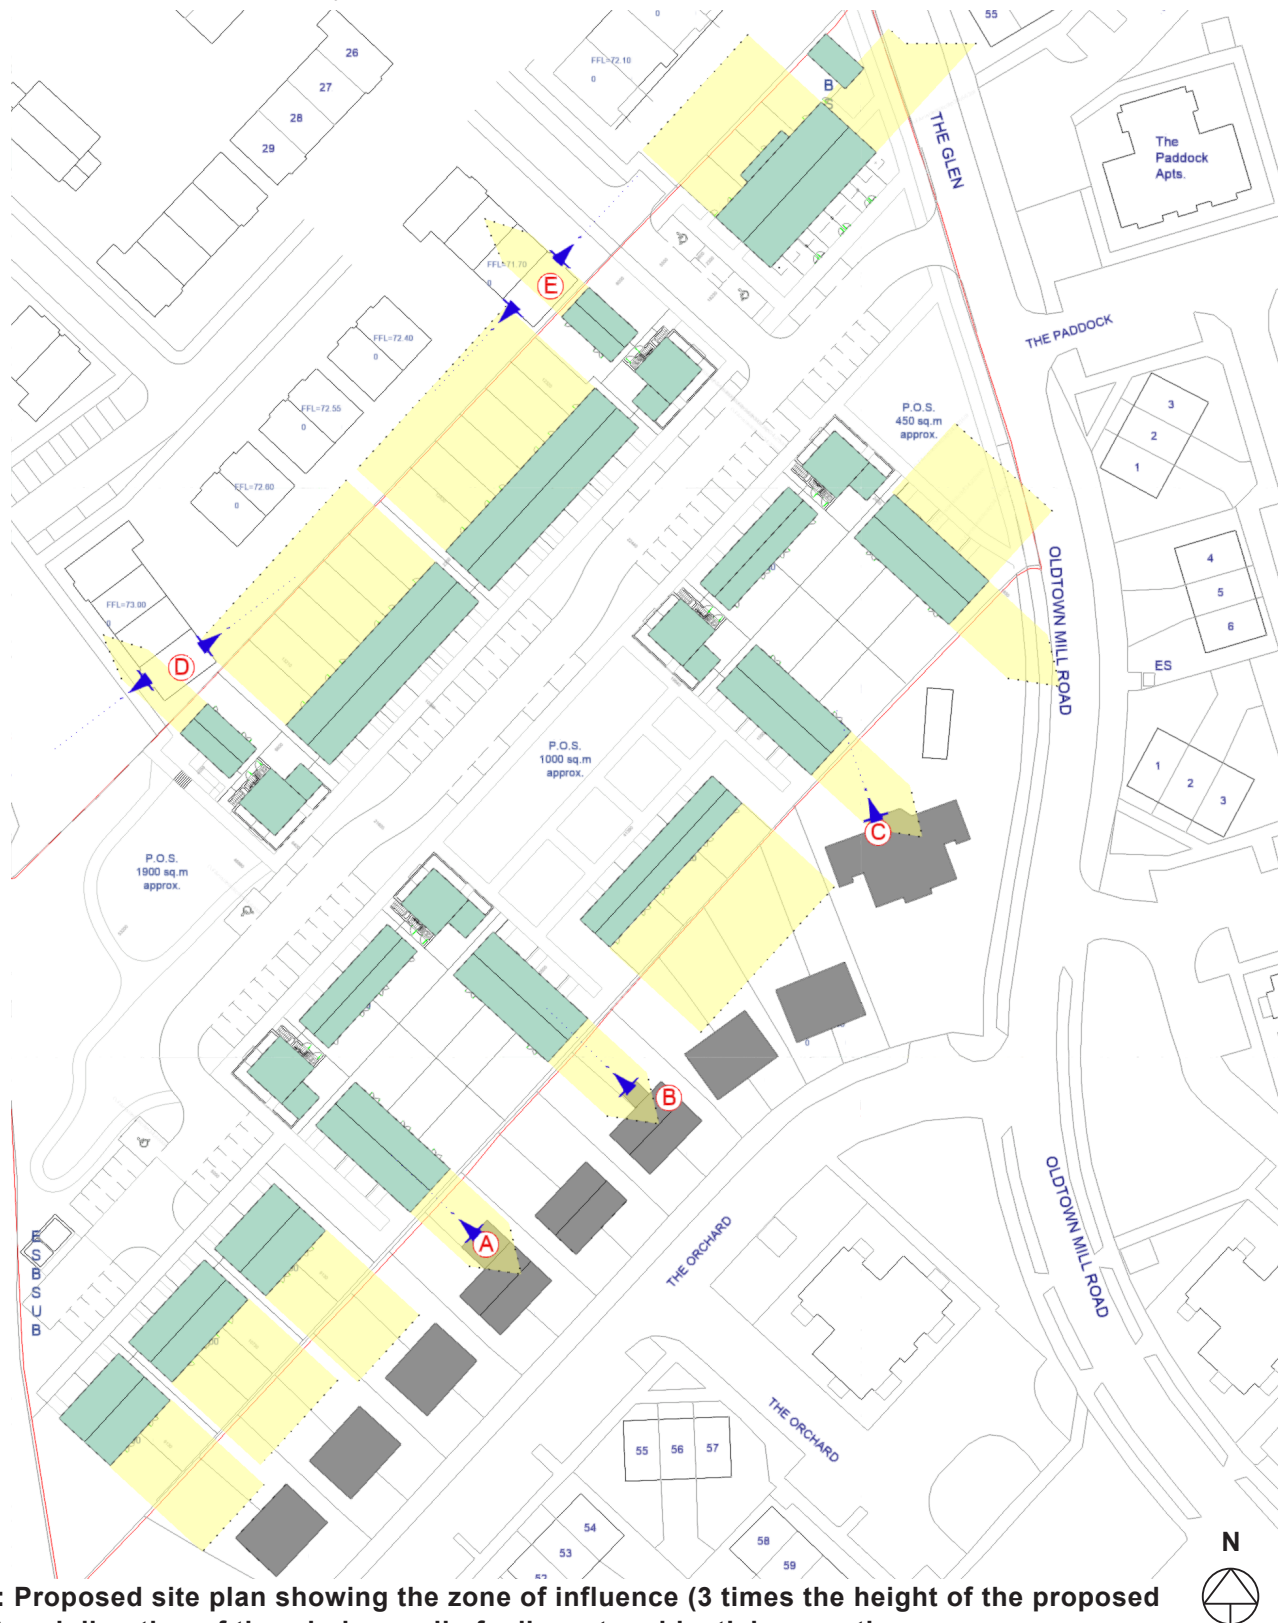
Proposed site plan showing the zone of influence (3 times the height of the proposed building) and direction of the window wall of adjacent residential properties.
